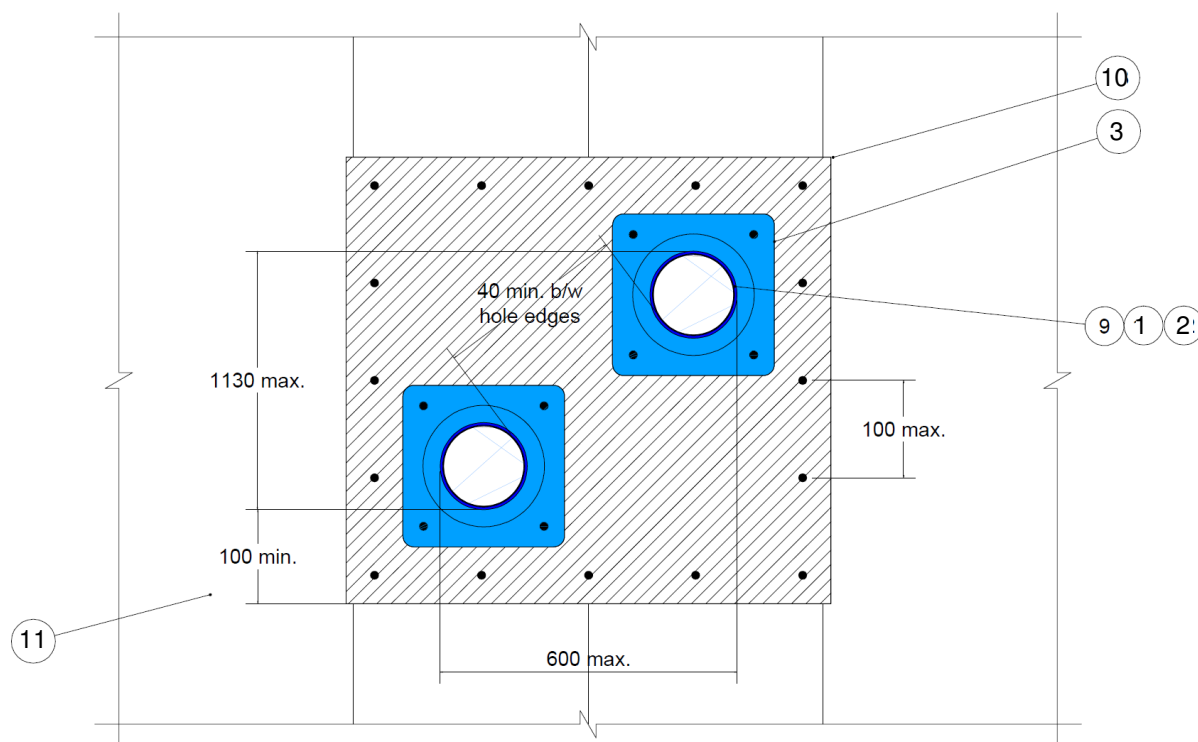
Plastic Pipes with PROMASEAL® FC Collars in Floors with Bondek® Steel Deck
